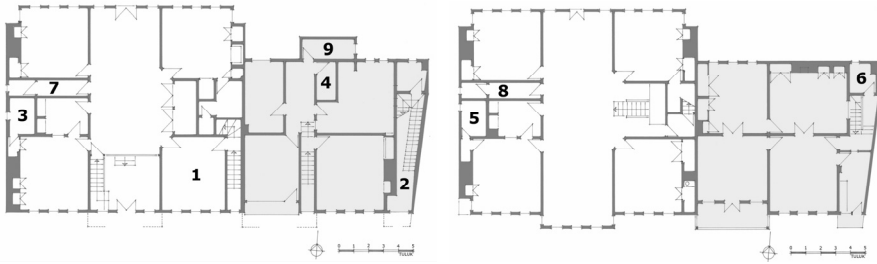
The existing ground floor and first floors of the Yalçınlar Mansion
